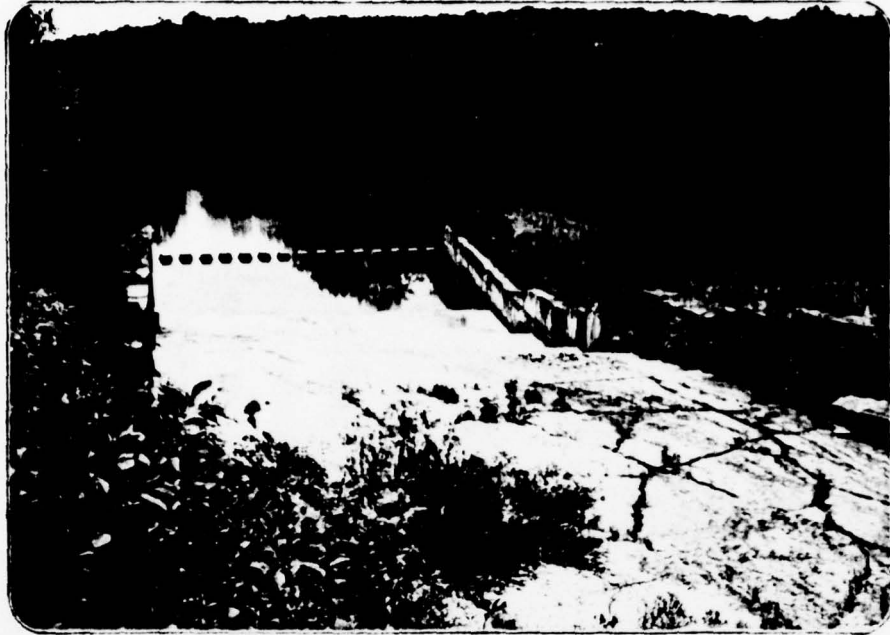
View Looking Downstream at Spillway Discharge Channel and Stilling Basin
